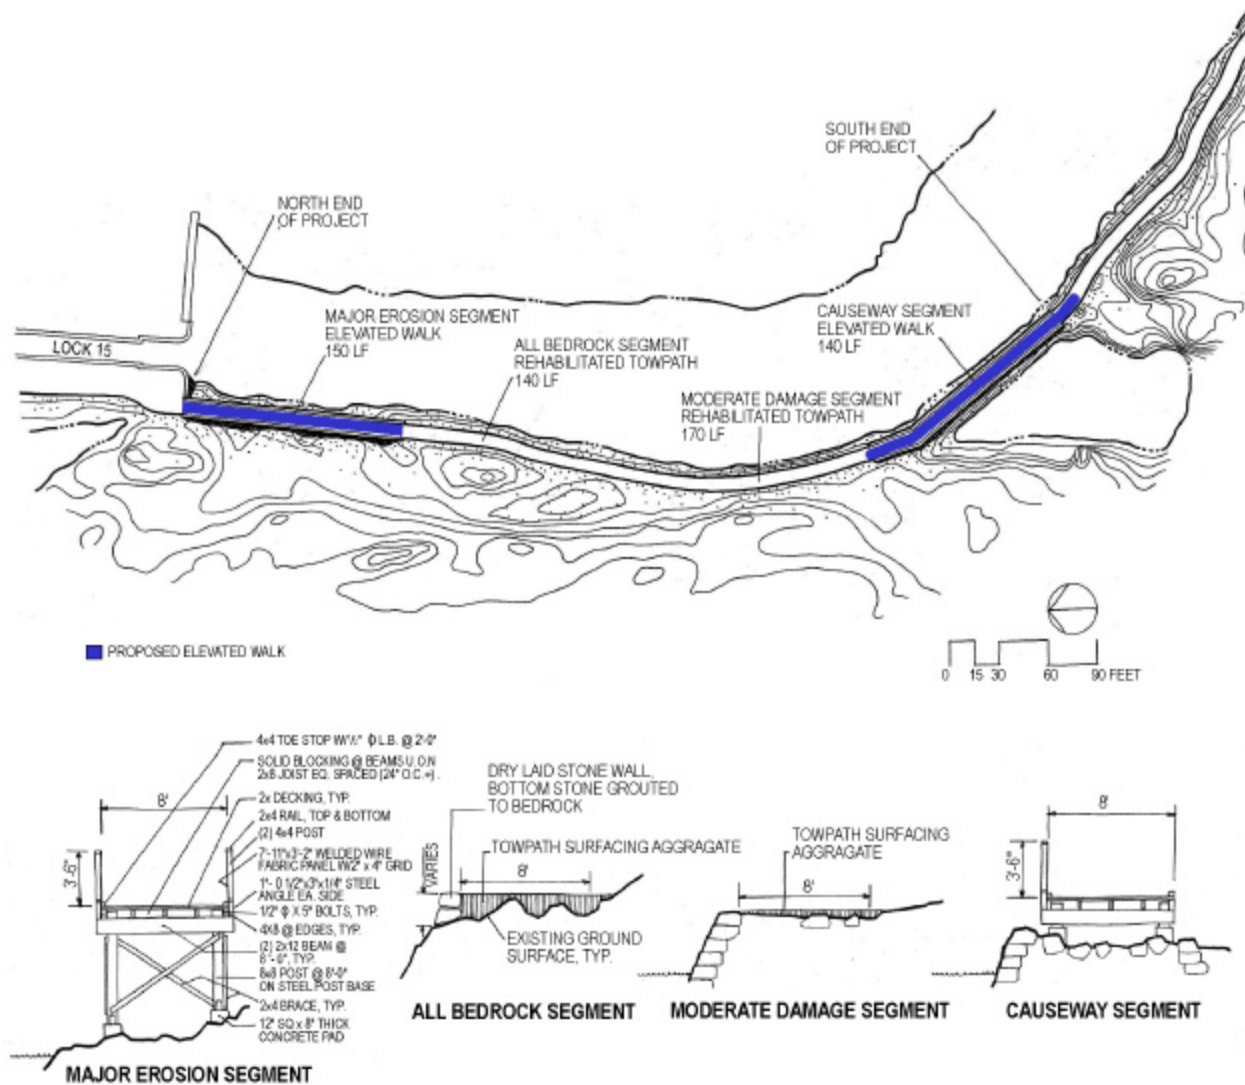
Aerial views and cross-sectional view of Alternative B – Two elevated walks.
